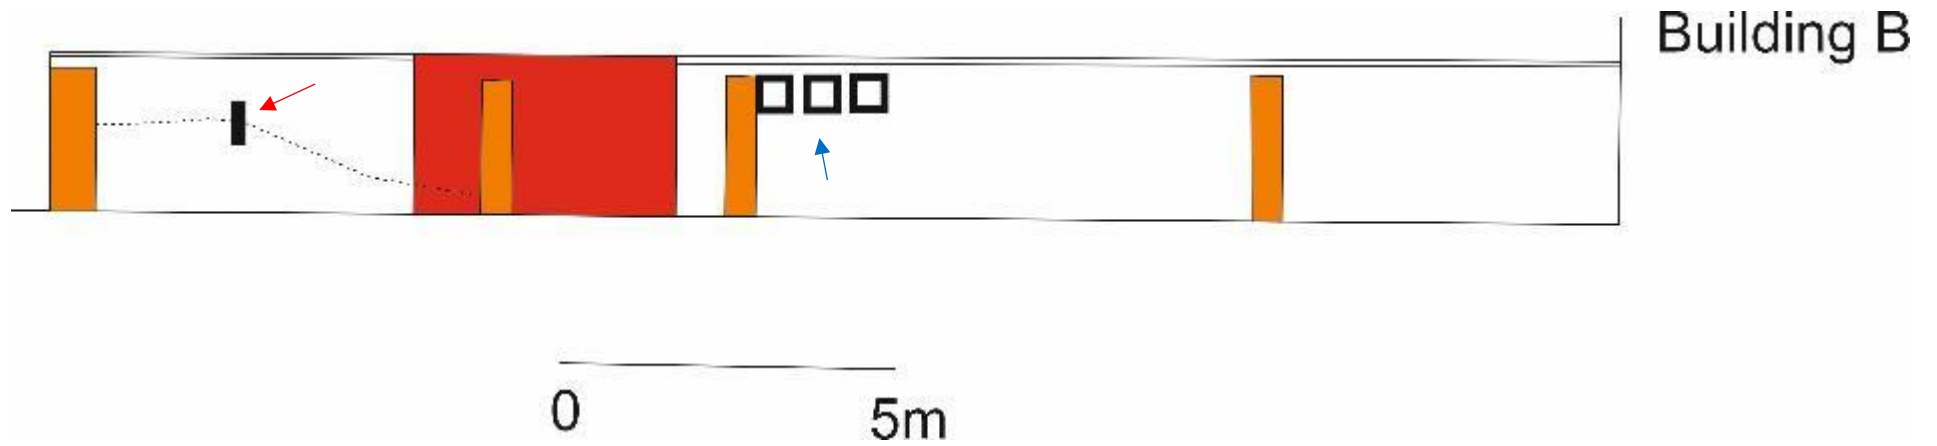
Drawn South Western Facing elevation of Boundary wall C, buttresses against wall face shown in brown, blocked former entrance in red. Red arrow shows slit window, blue arrow shows bird boxes. Dotted line indicates top of rubble dump against wall face.
